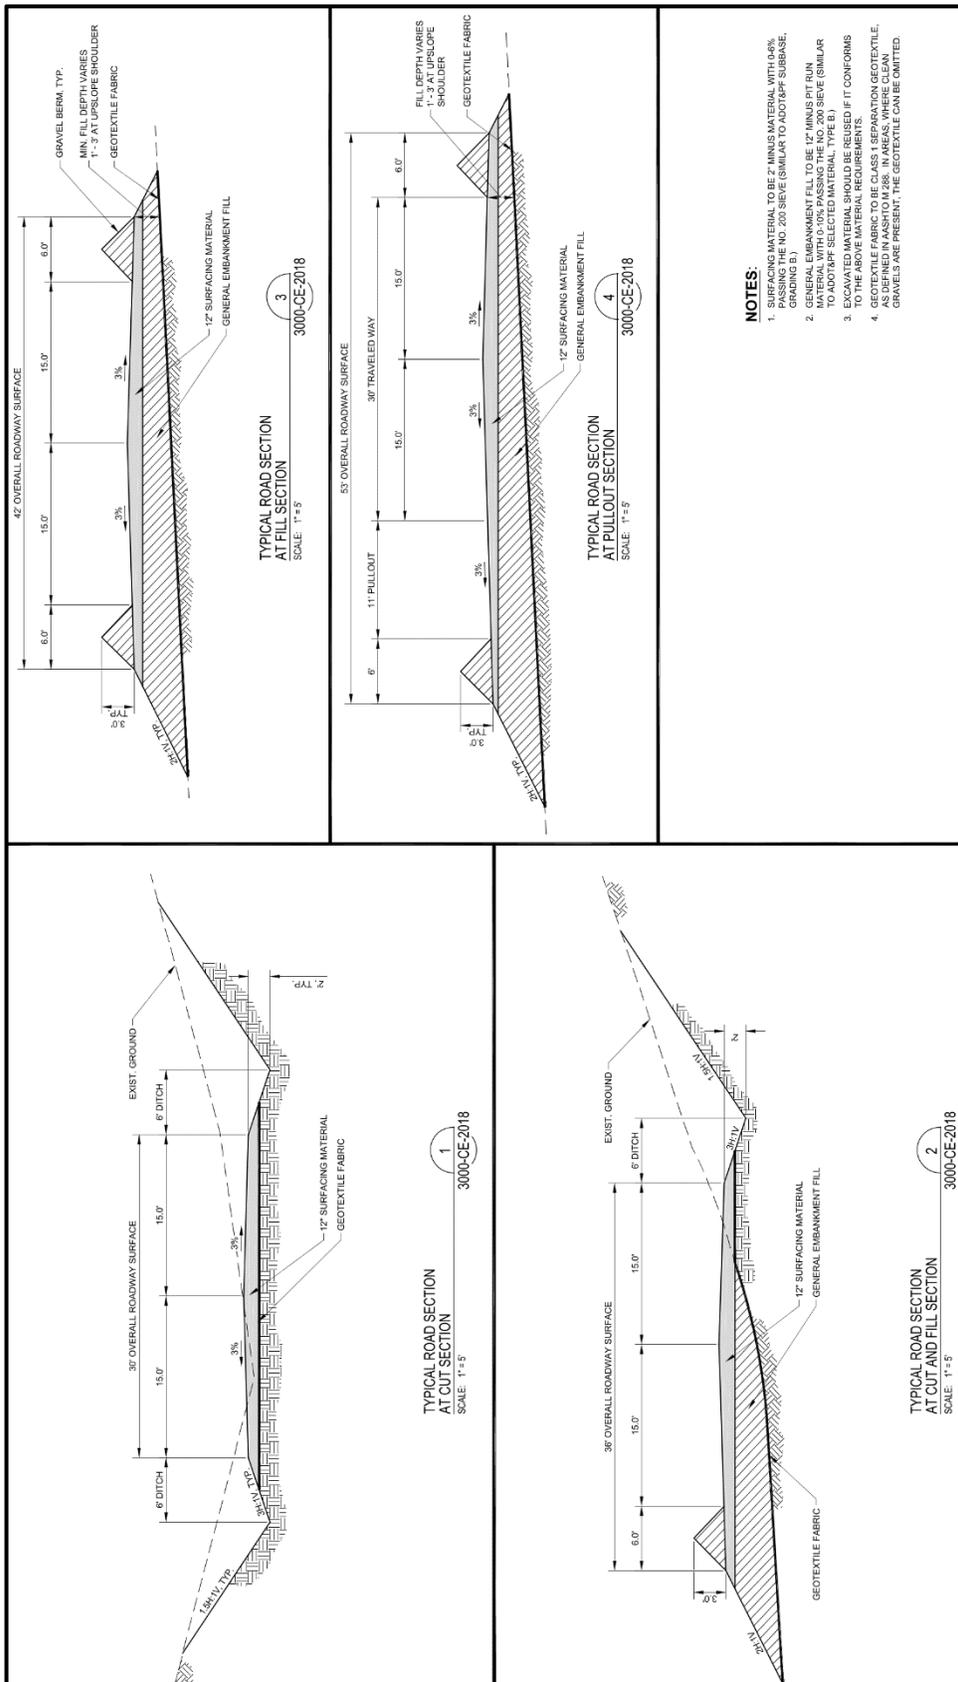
Access Road Typical Cut (top) and Fill (bottom) Sections
